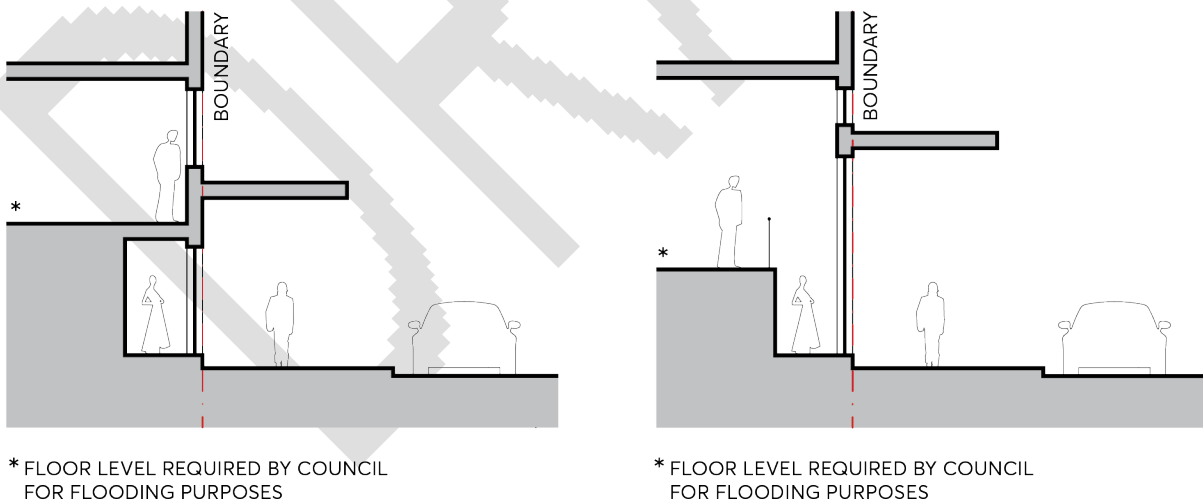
XX – Active Ground Floor: Floor level required up to 1.5m above footpath level
